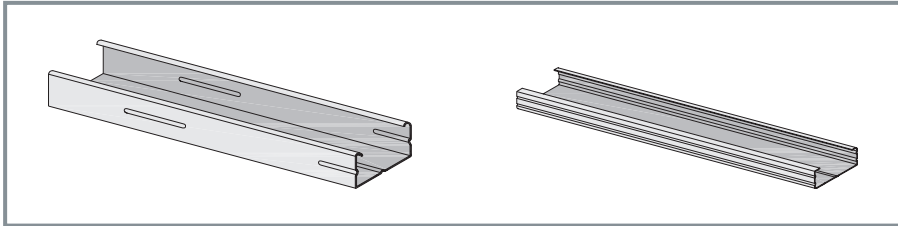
Ceiling channels, e. g. CD 60x27 and F47
